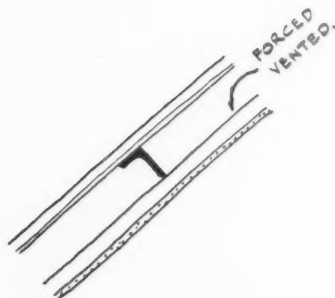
(b). Roof with forced ventilation in cavity.—The external roof covering should have a reasonably good thermal insulation value and an absorbent under surface. The insulating lining under the covering should have a low vapour diffusance. Dried and heated air is blown through the cavity between the external covering and the lining.
